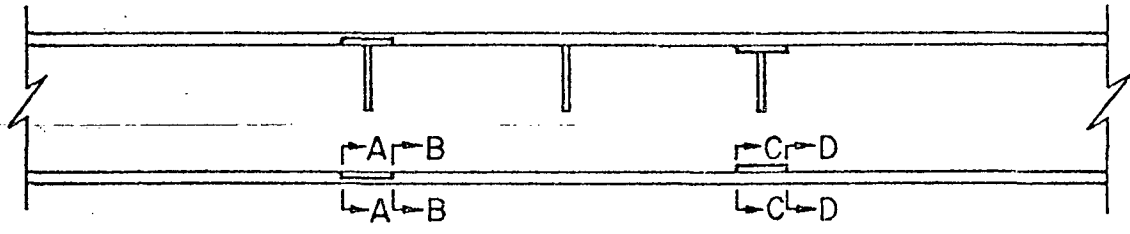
Fatigue Cracks at Two Million Cycles
